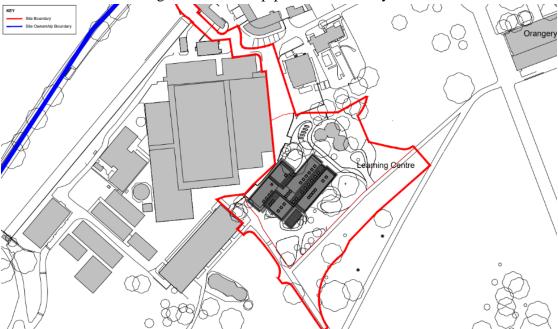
Proposed site plan. Drawing No. 0004 by Hazle McCormack Young LLP.
